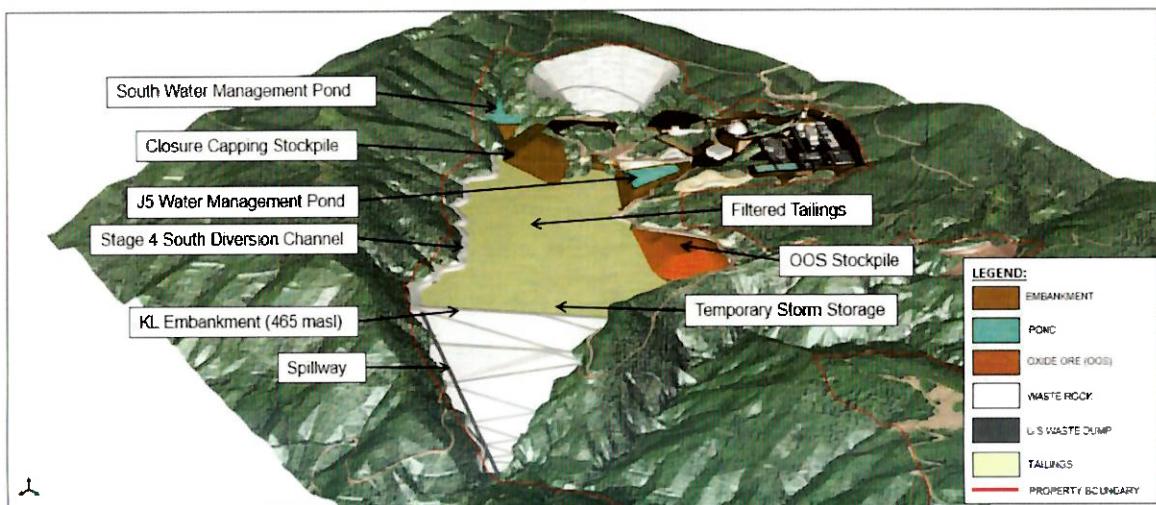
Indicative Phase 1 IEWMF Site Layout (Year 10)
